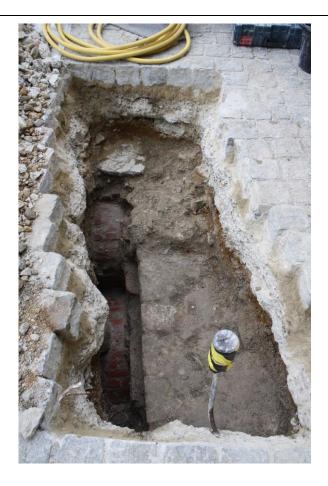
Test Pit 5, facing north. Cathedral's foundation can be seen to the right and culverts the left..
